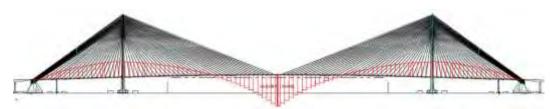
Erection stage – Remove tie and transfer tension to deck
